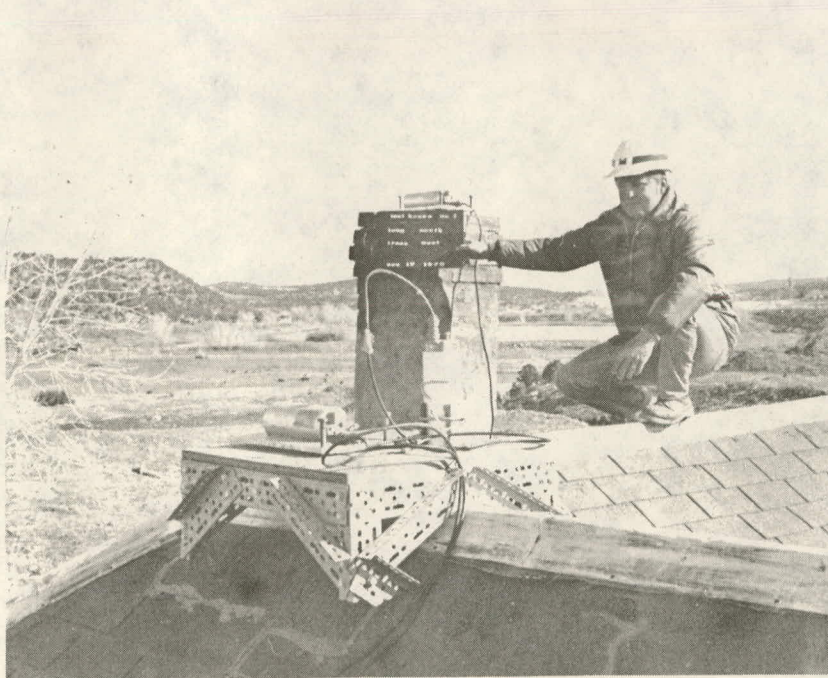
Station #1, Test House #1, looking northeast. Seismometers on roof and chimney.
